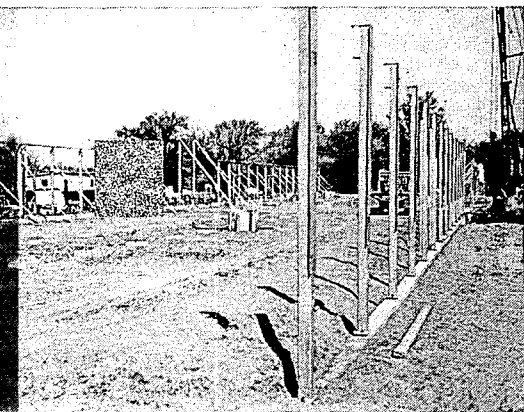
construction views of Otter Creek Elementary School, North Terre Haute, Indiana. Example of “packaged-plans” school uses standard, readily accessible building products adapted to basic, flexible plan.
